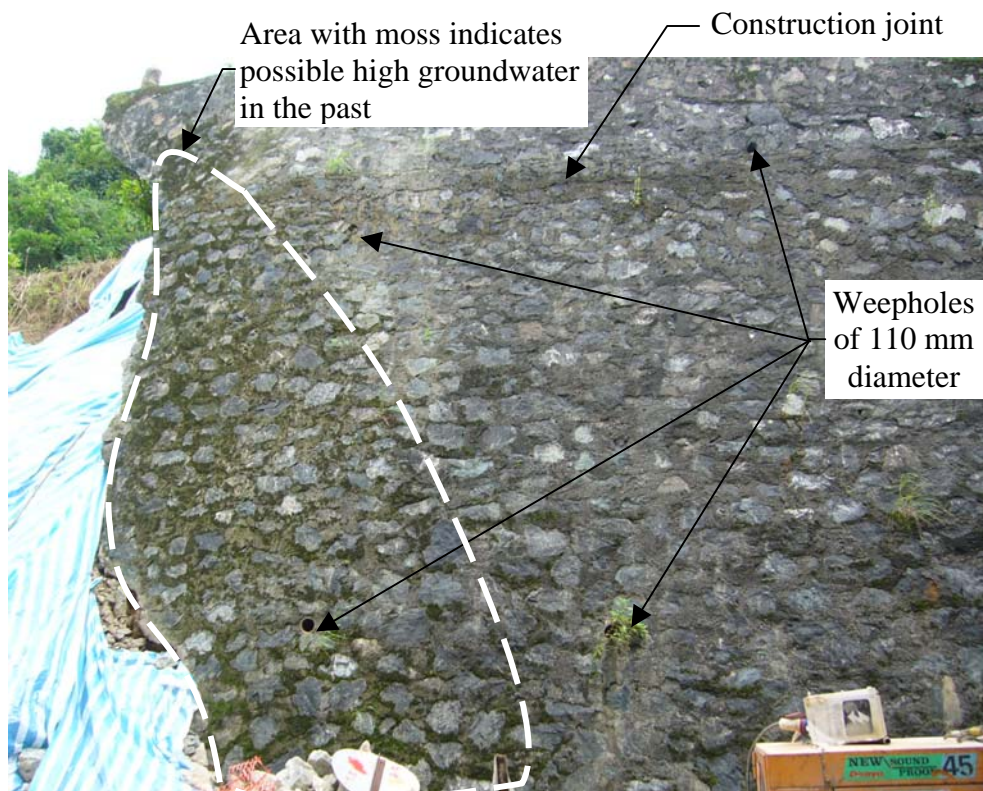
Front View of the Masonry Wall Portion of Slope No. 7NE-D/FR58
